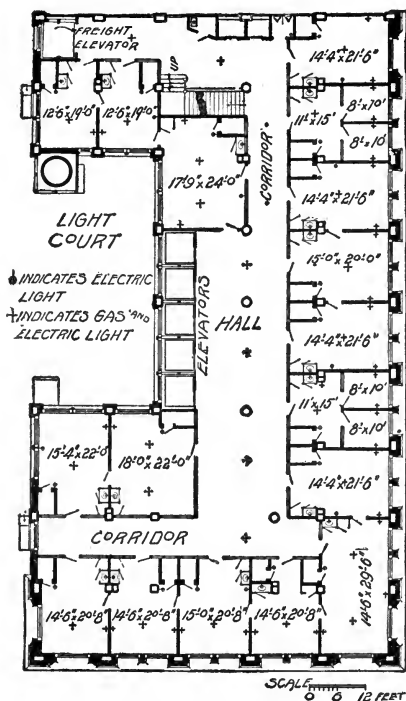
New York Life Insurance Building, Chicago. Typical Office-floor Plan.
